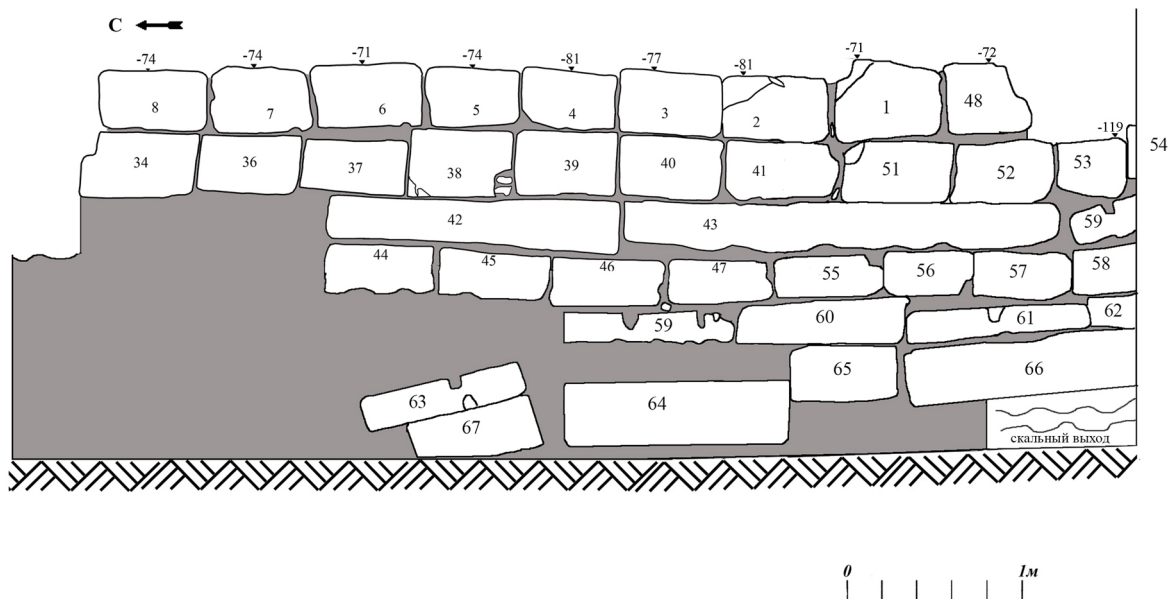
Monumental architectural structure on river Rubas. Structure No. 5 (Platform). Western façade with indication of Nos. of blocks and sections. 2022
